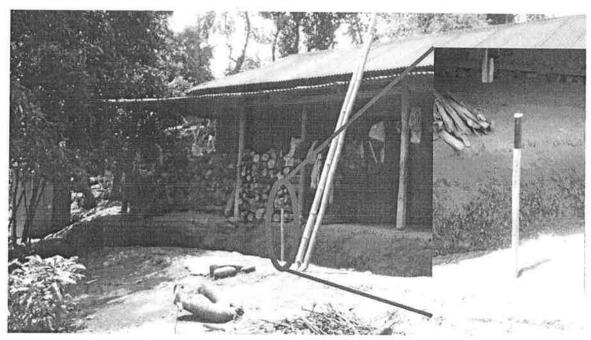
House Affected due to Propose Road Alignment @ km 72+580
